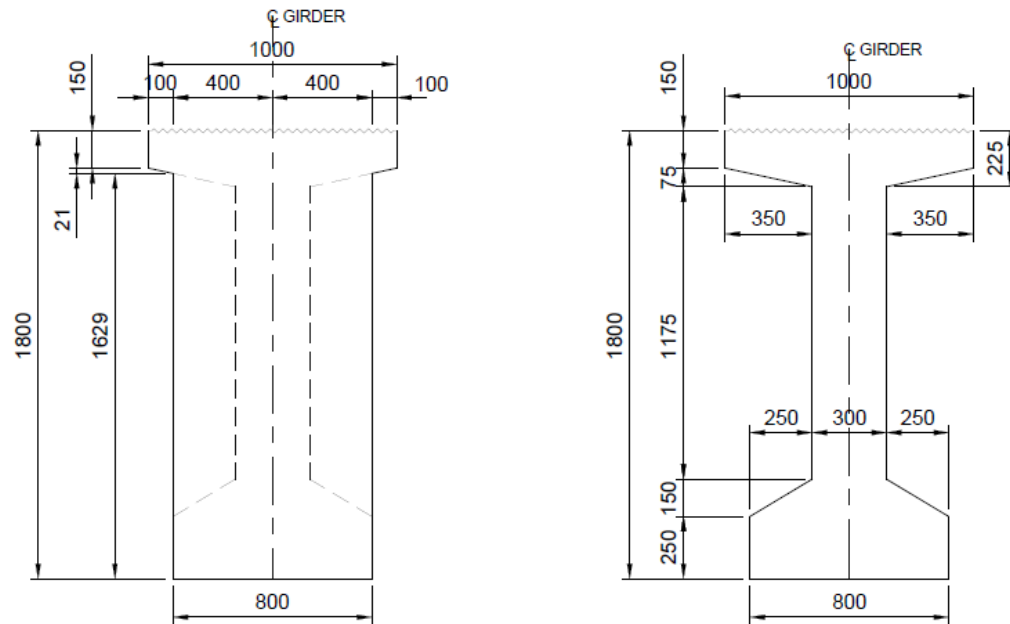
8 Girder section of 30m span OC post tensioned I girder at support and mid span
